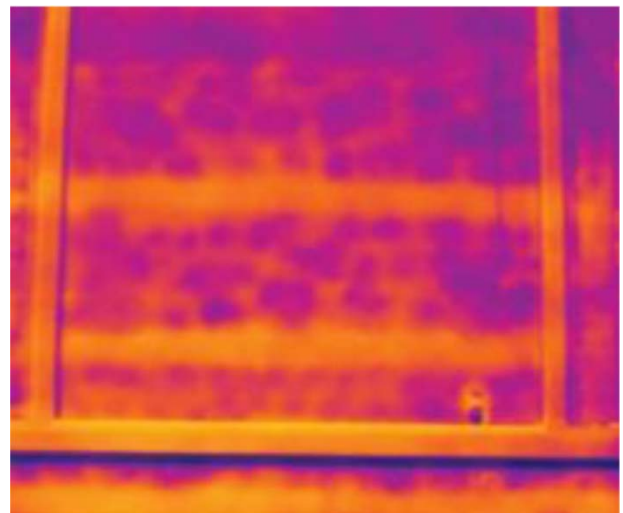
Wall texture - masonry striped with stones with double recourse of brick
